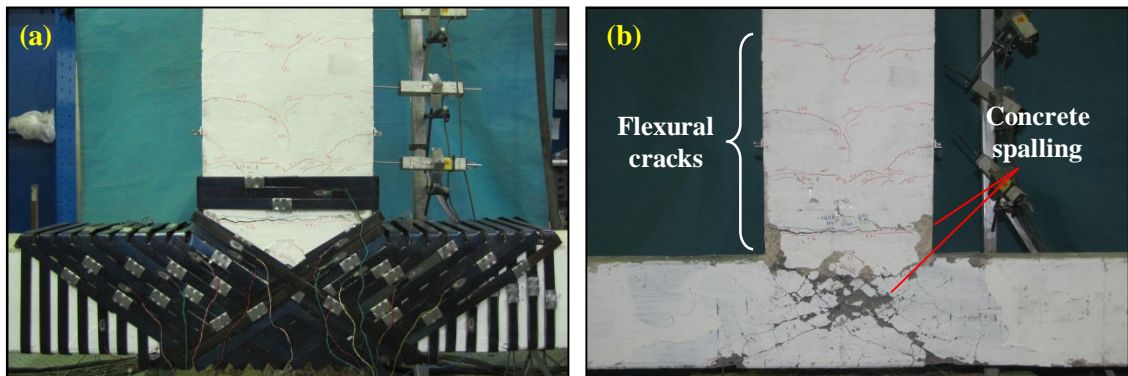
Final cracking Pattern a) with strips installed, b) after removing the strips
